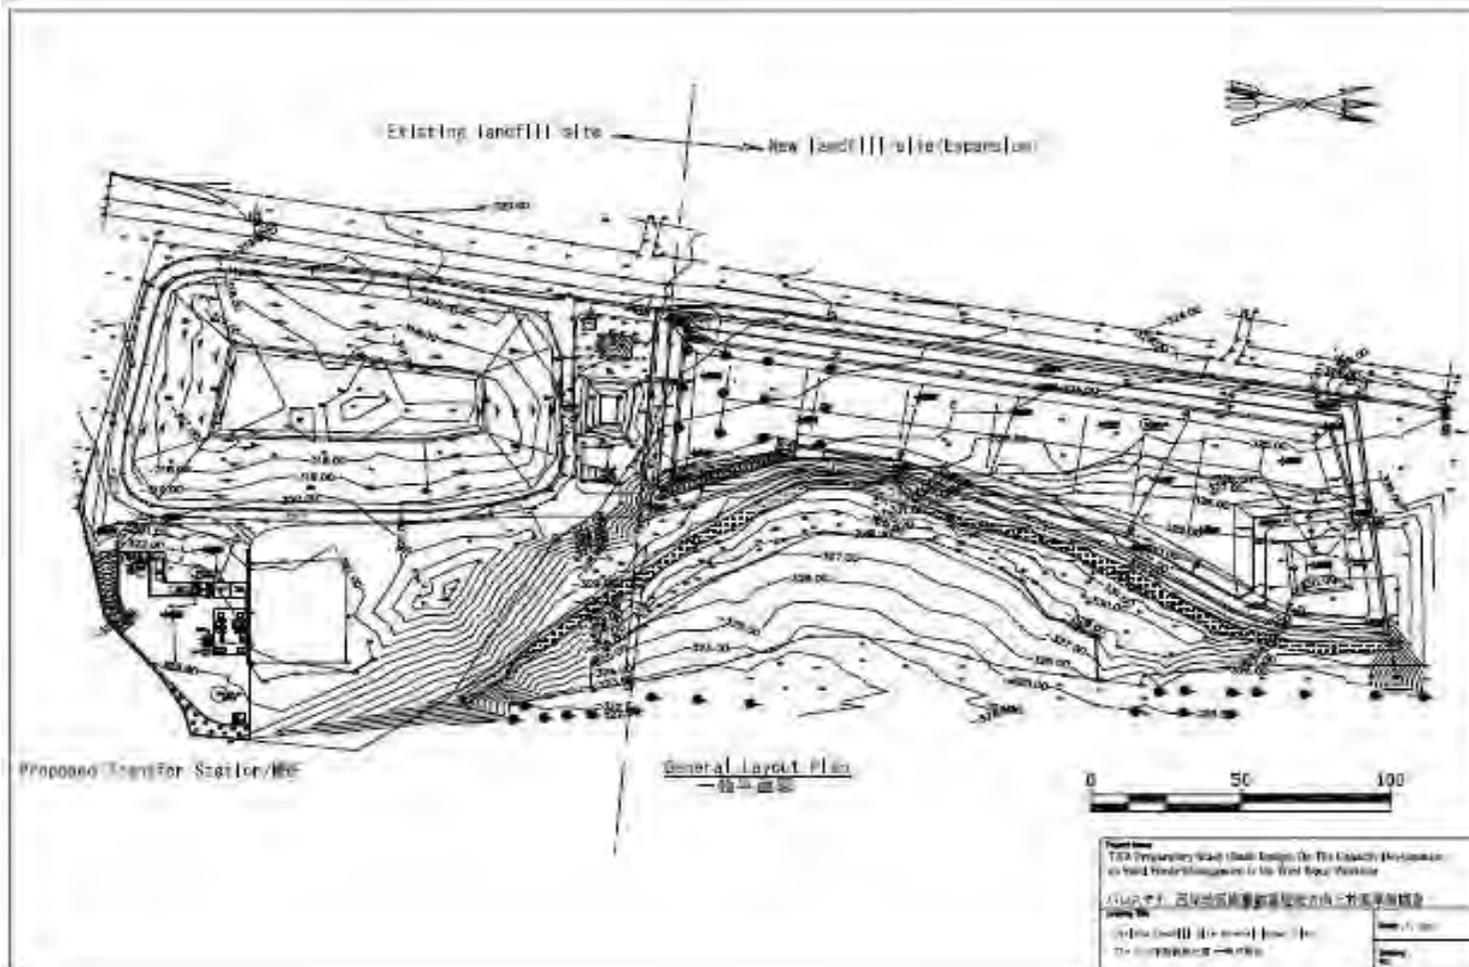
Plan of Extension of Final Landfill (Jericho JC)
